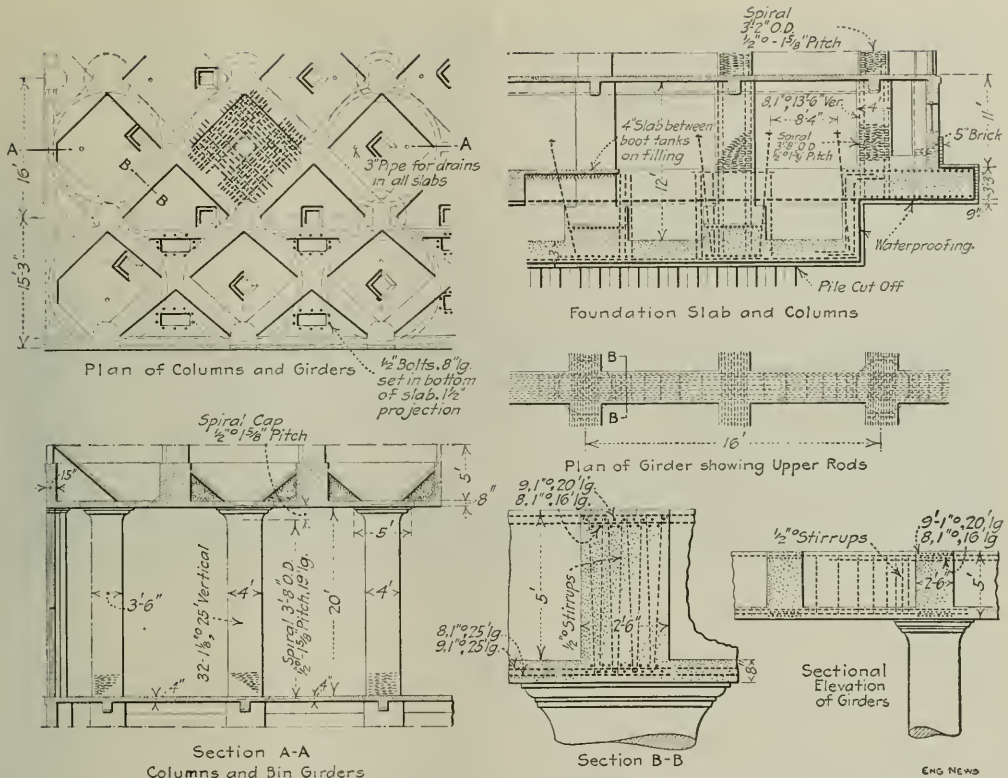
DETAILS OF THE WORKING HOUSE OF THE GIRARD POINT GRAIN ELEVATOR
